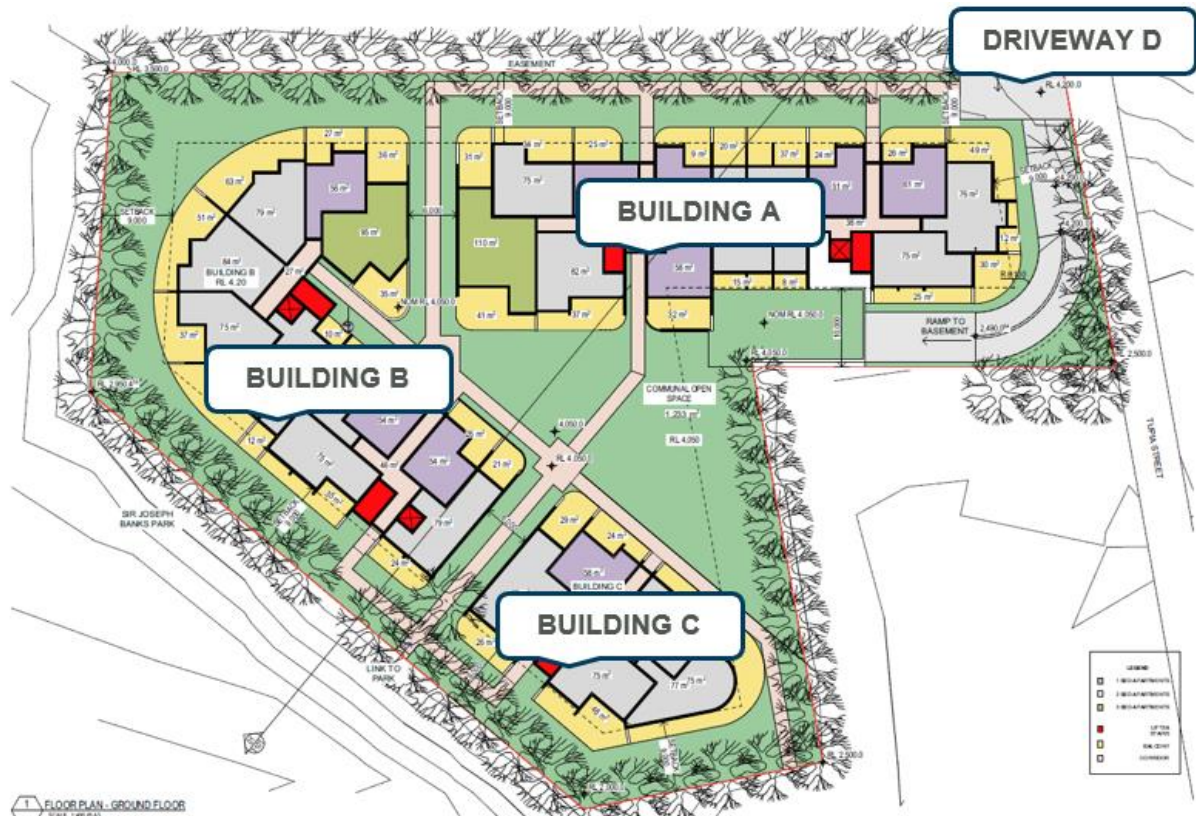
Proposed Development Layout (REF Project No. 6641, Drawing No. SK2003, Issue 01, TUPIA ST – RESIDENTIAL FLAT BUILDING OPTION FLOOR PLAN – GROUND FLOOR)
